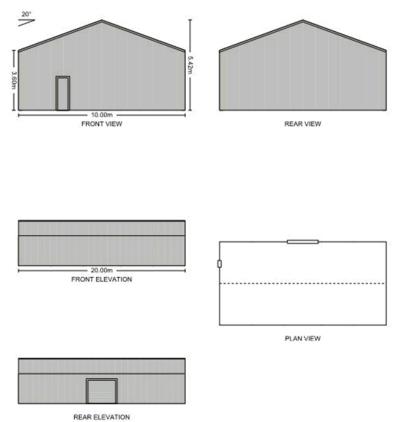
Elevation and floor plan of the proposed storage shed at 30 Mcrobies Road, South Hobart.
